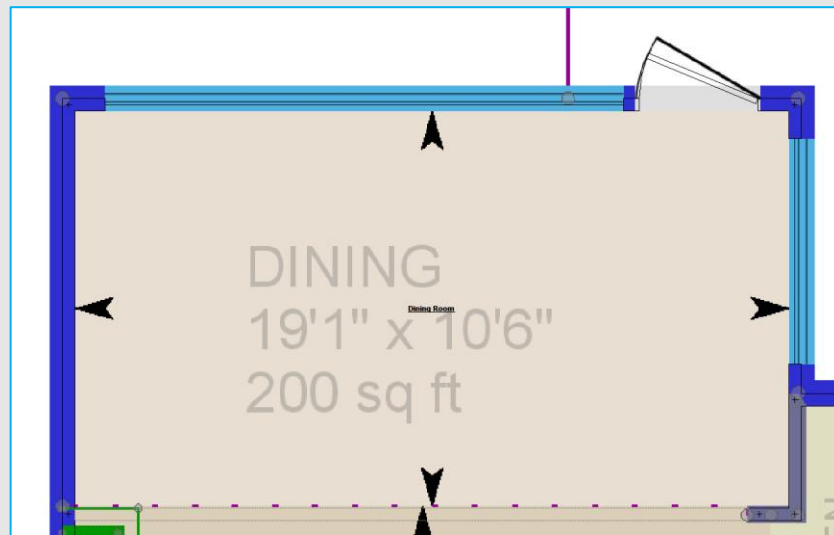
Exterior Walls Drawn to the Interior Face of Walls
